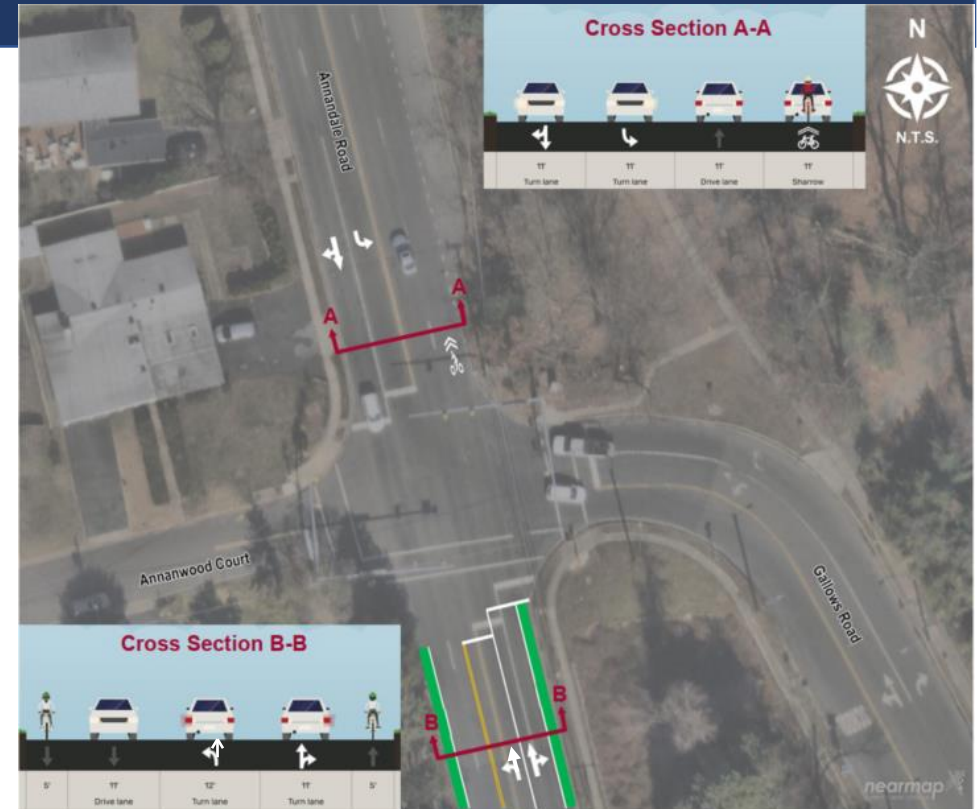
Intersection of Annandale Road and Gallows Road Build Conditions Cross Section and Plan View
